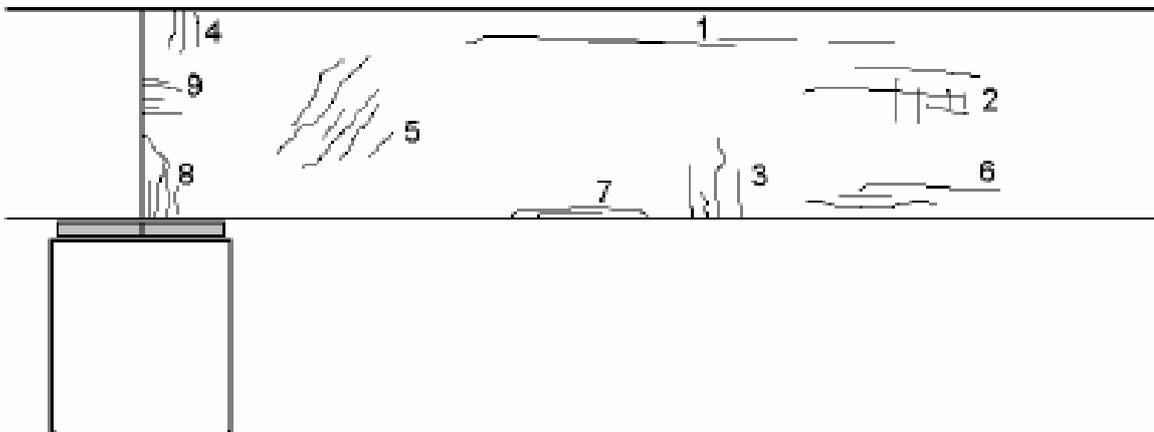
The most common types of cracks in railway girder structures.
